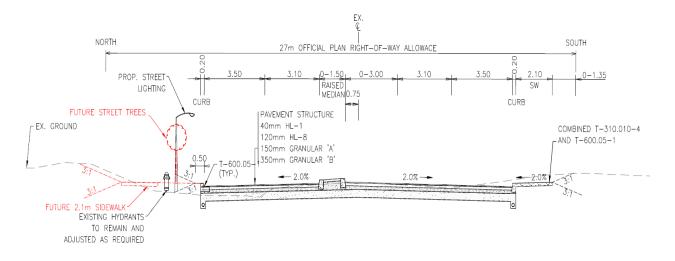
Passmore Avenue Intersection Approach Typical Section
